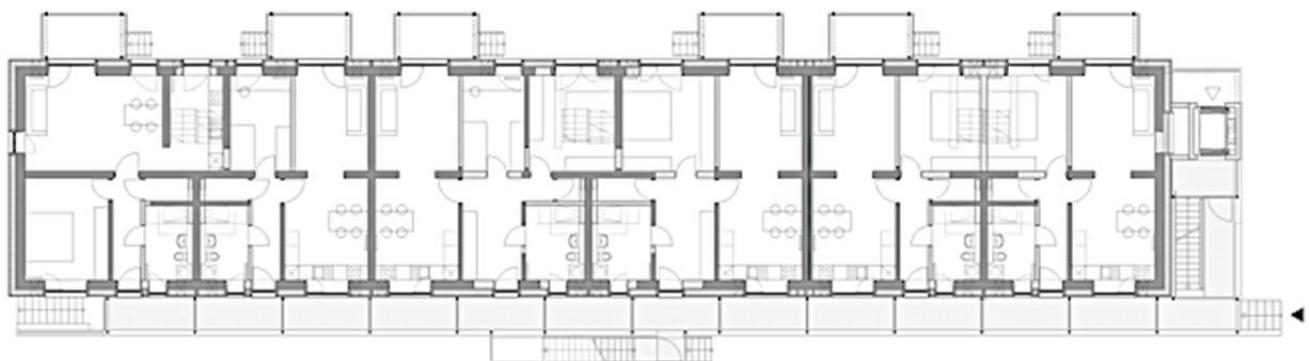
House 48: Floor plan showing reorganisation and conversion within old carrying structure
